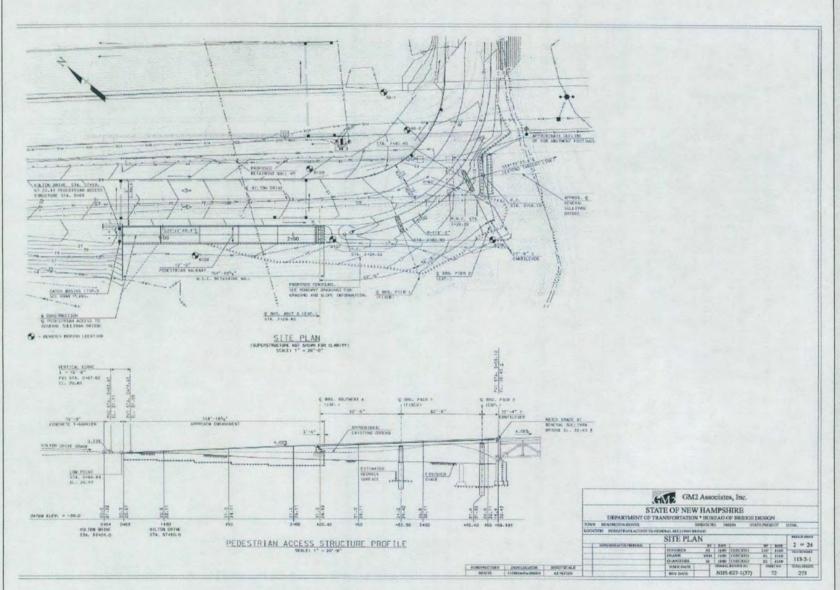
plans for the new north bridge approach and abutment modification, Site Plan.
